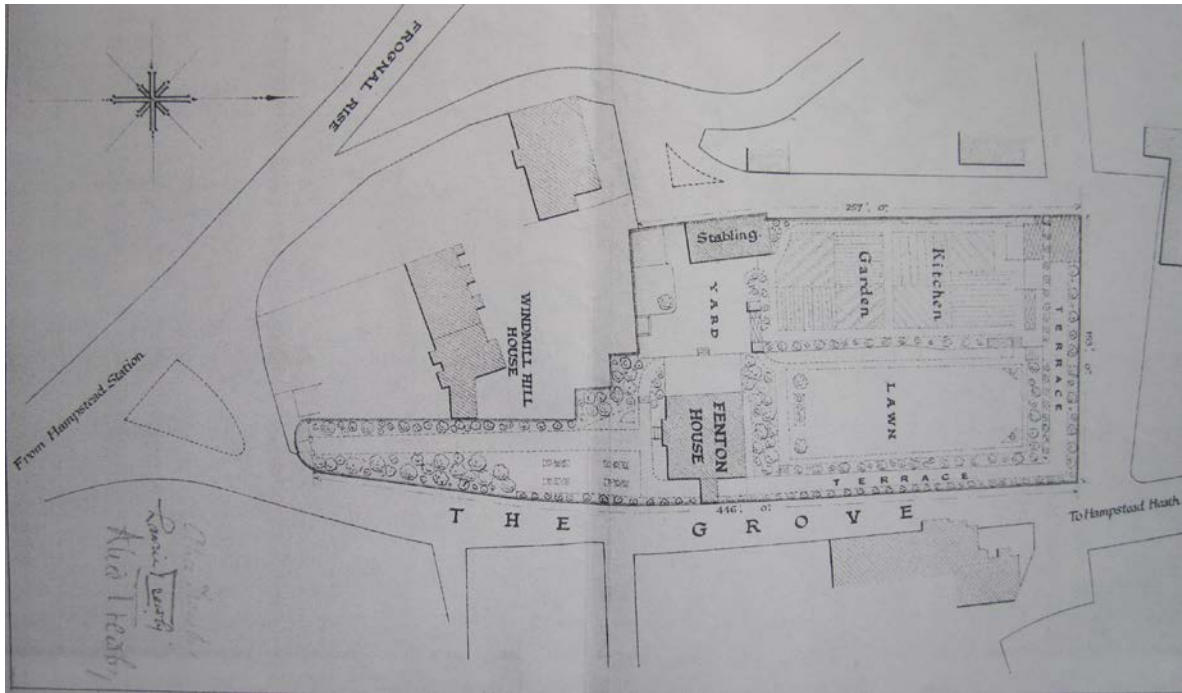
Ground floor plan (Belcher & McCartney 1900)
